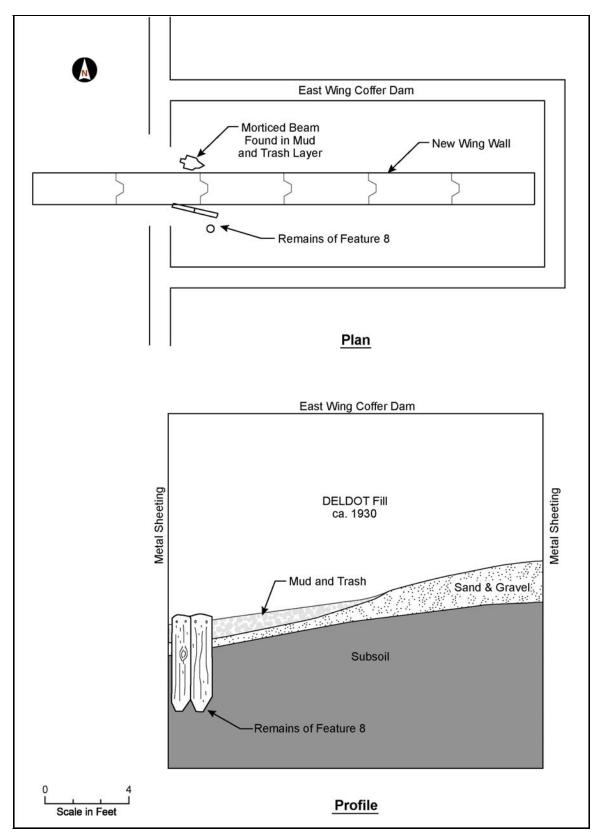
Wing Wall Monitoring, Plan and Profile Views.
